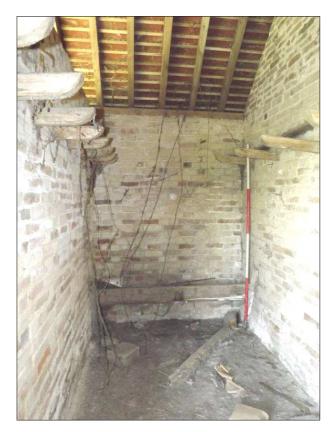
(Shot 55): B1 interior, looking north-northwest. Note former floor joists in wall to left of shot. 2m scale
